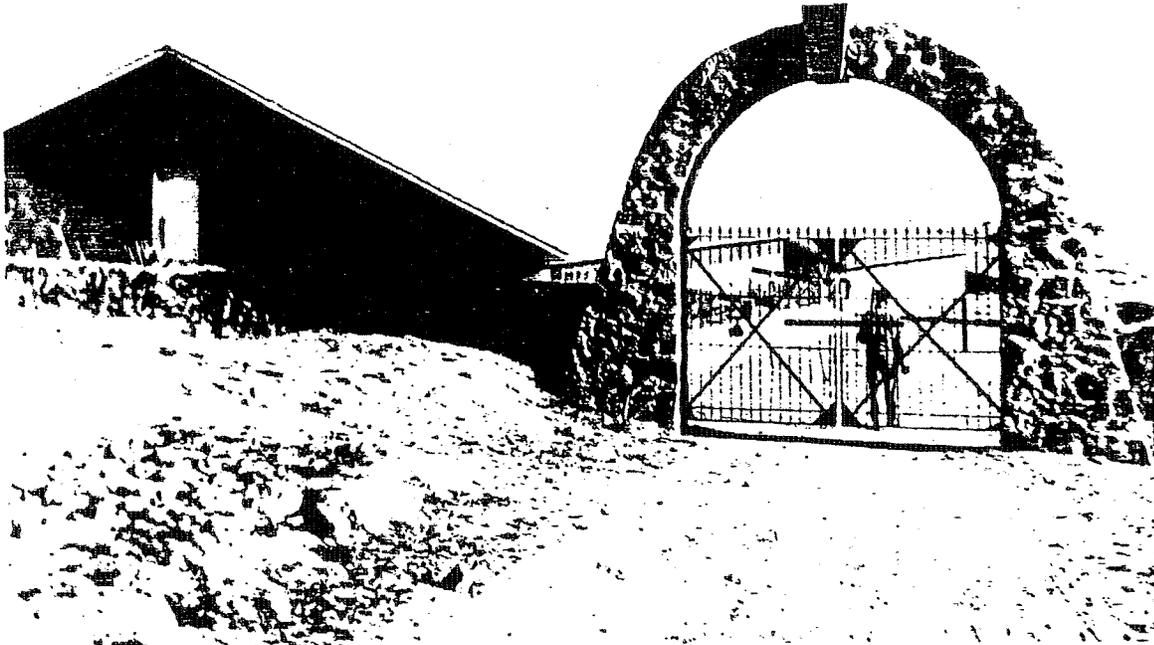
Old Post Reservoir, 1943. WPA installed stone masonry arch during the 1930s.
